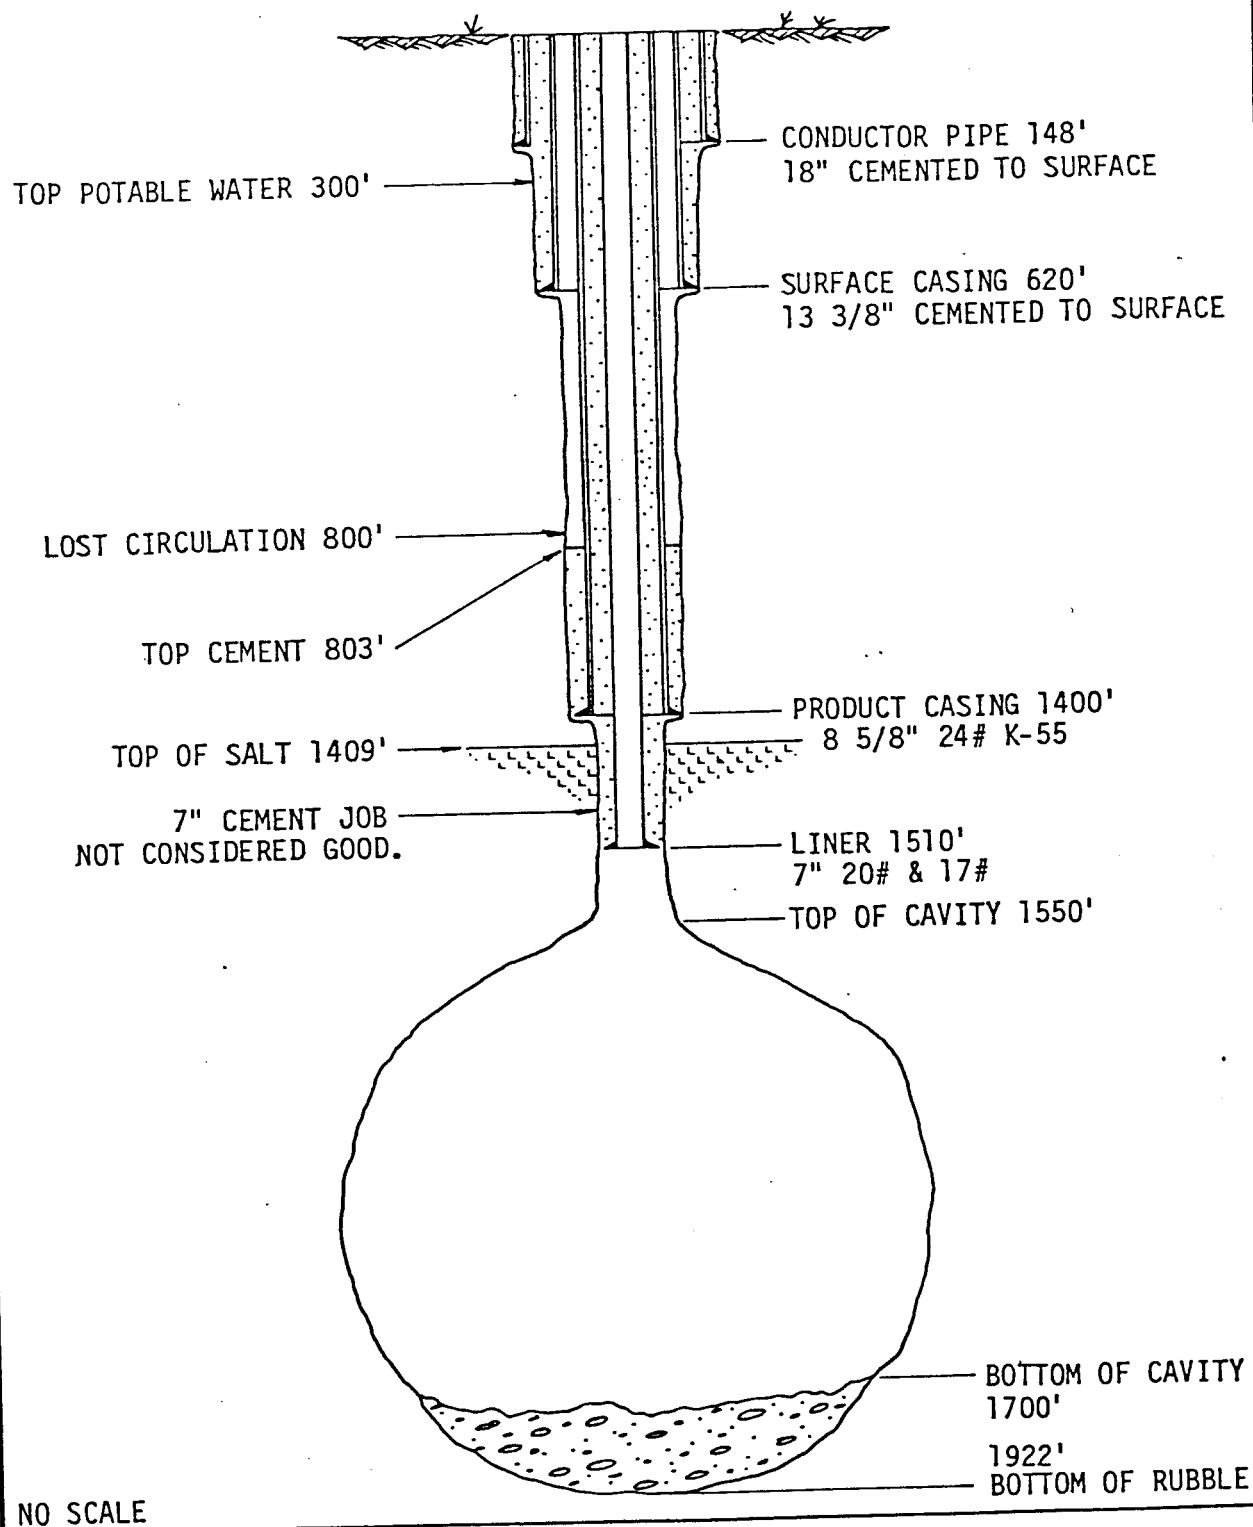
Sketch Showing Present Construction of Storage Well No.1
